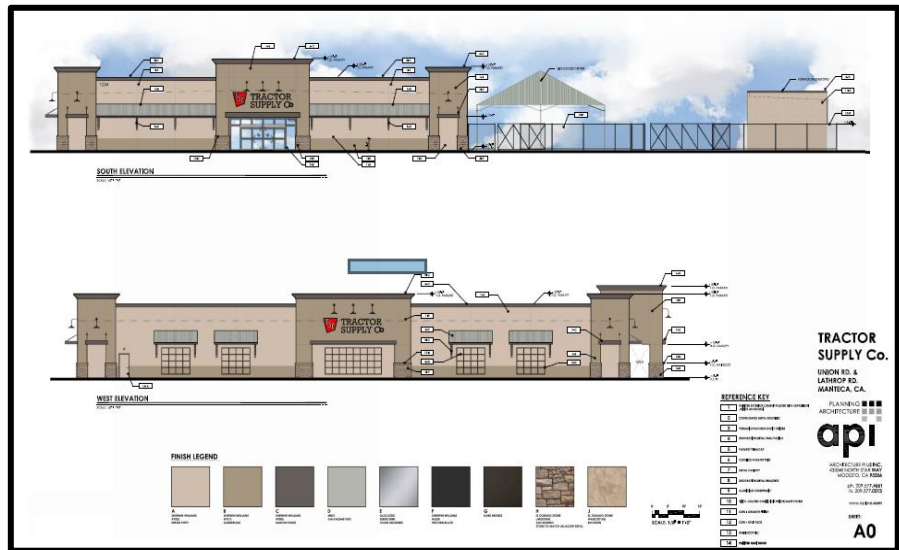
SOUTH AND WEST ELEVATIONS OF PROPOSED TRACTOR SUPPLY
